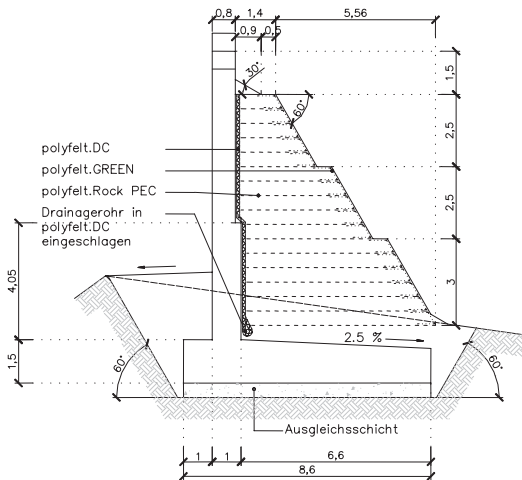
Avalanche-protection wall Lanersbach, cross section
